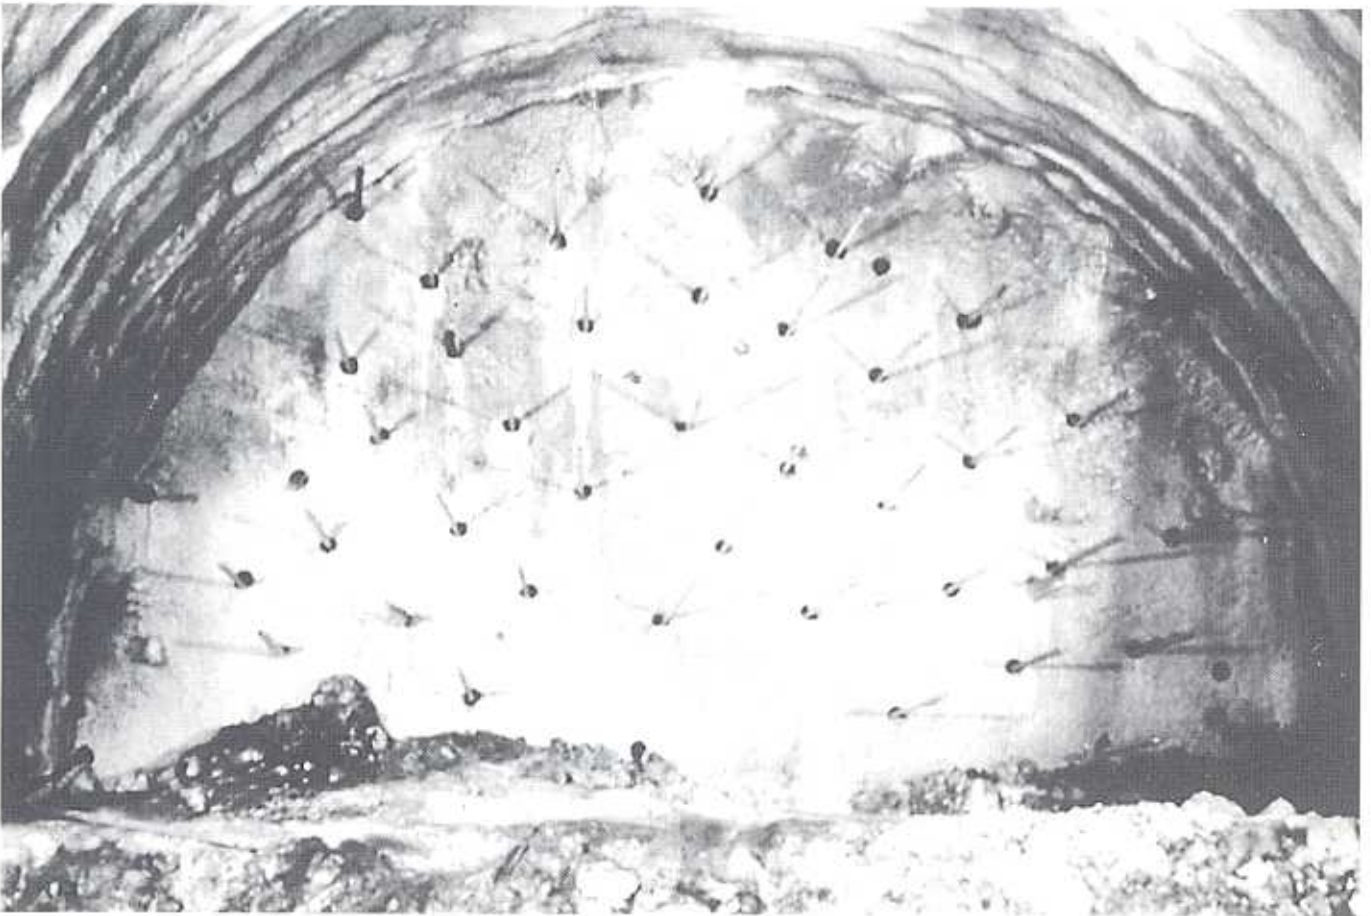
Jet-grouting used to stabilize the face of a tunnel in Rome
